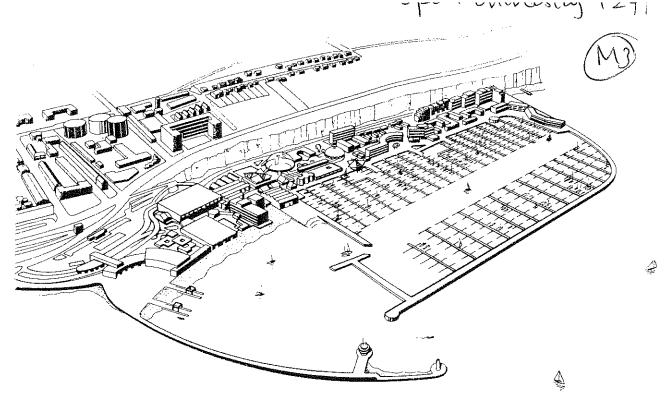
Sketch of the 1968 version of the Marina plan. This shows a fully tidal harbour with all the building development on reclaimed land between the undercliff and the sea
